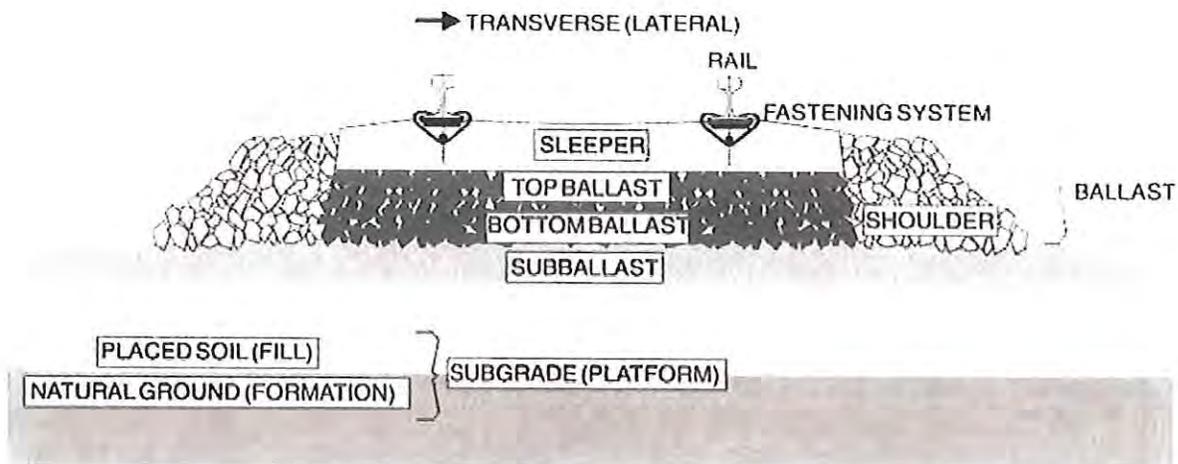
Track layout of a typical ballasted track –cross section (Selig & Waters, 1994)
